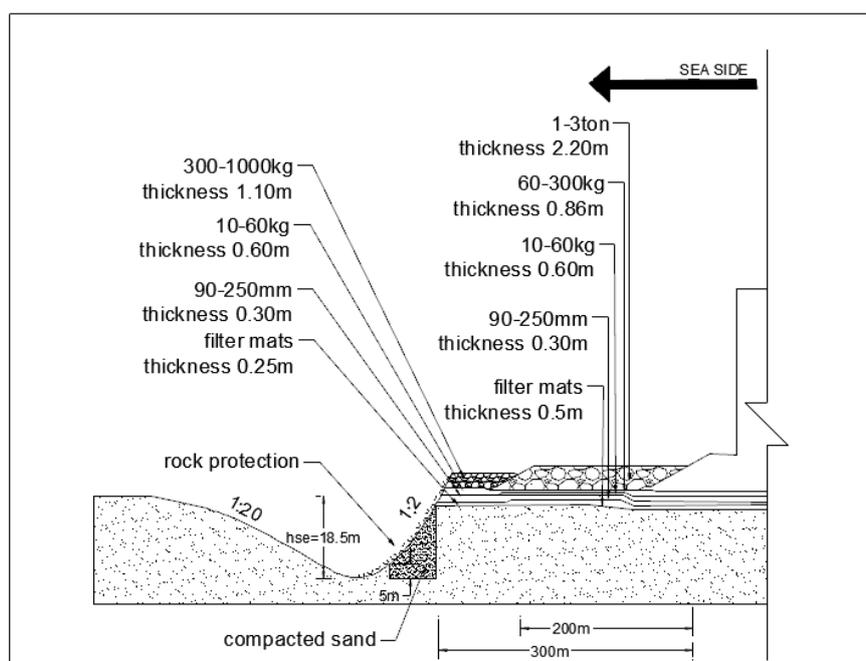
41. Section view of designed bottom protection at both sides over the whole barrier length
